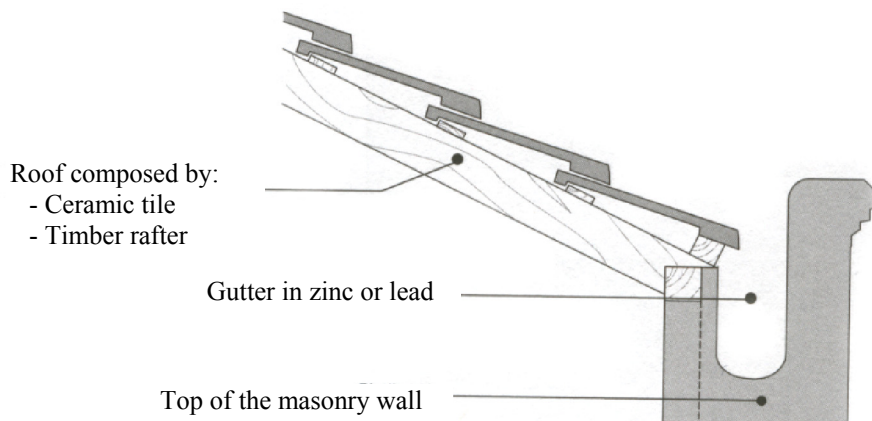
Cross section of the “gaioleiro” building’s roof (adapted from Appleton 2005).
